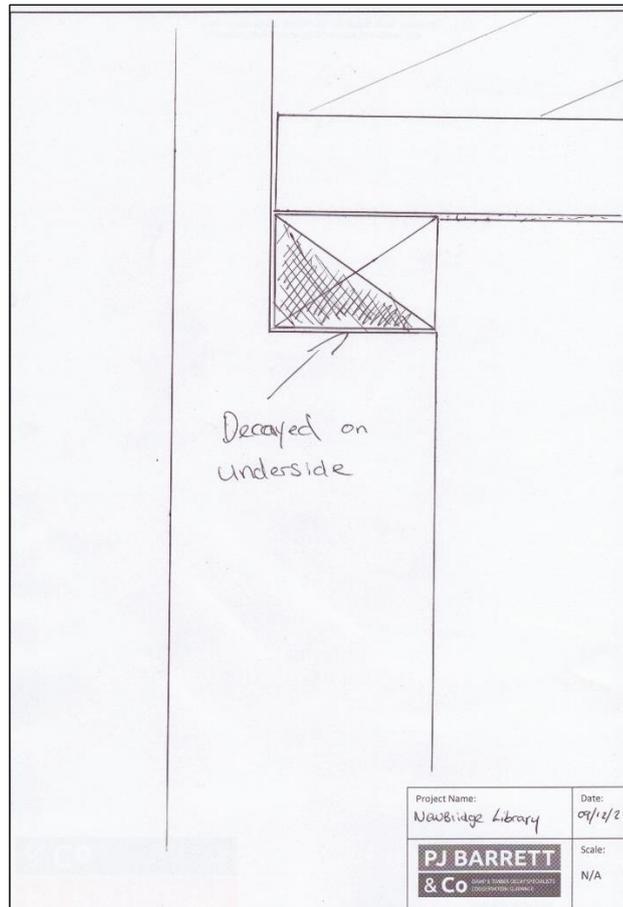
Site sketch showing the decay at the wallplate where it was opened up.
